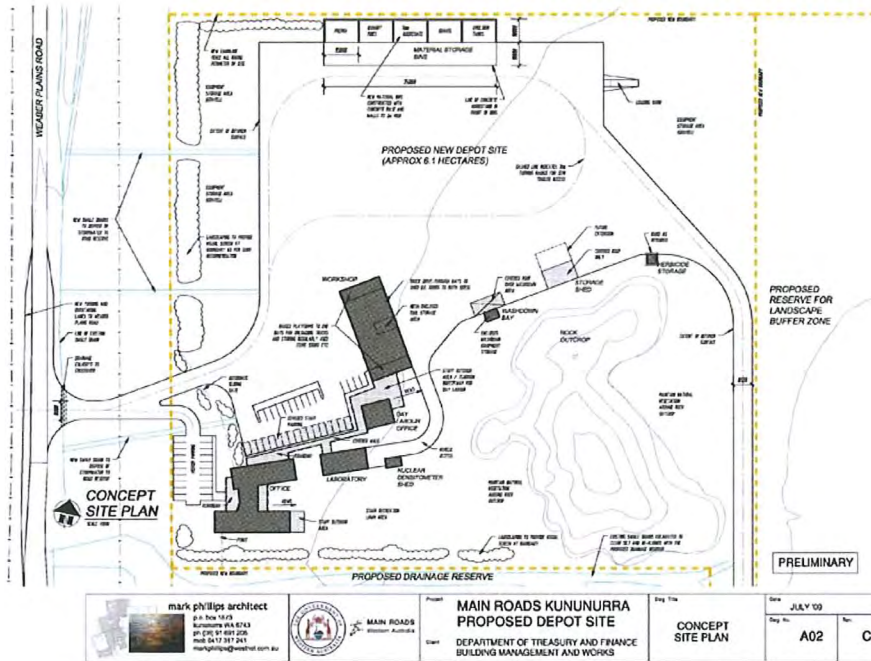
MRWA Kununurra Proposed Depot Site – Concept Site Plan
